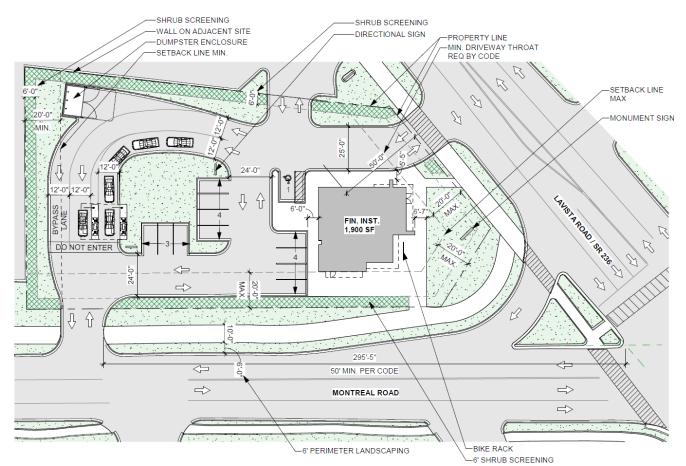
Proposed site plan showing 0' and 20' front setbacks along Lavista and Montreal Roads.
